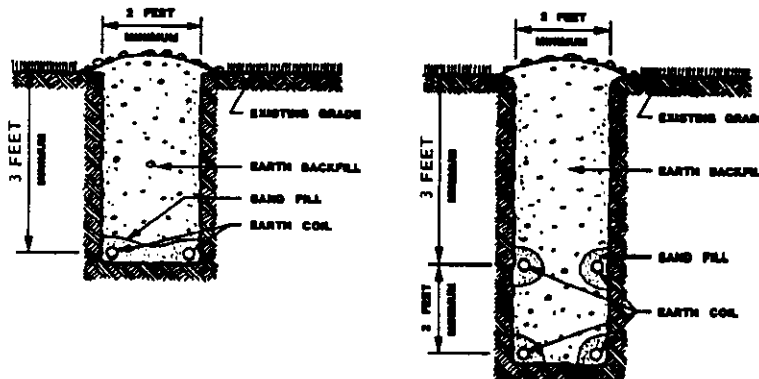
B. Two Pipe and Four Pipe Earth Coil in a Wide Trench
